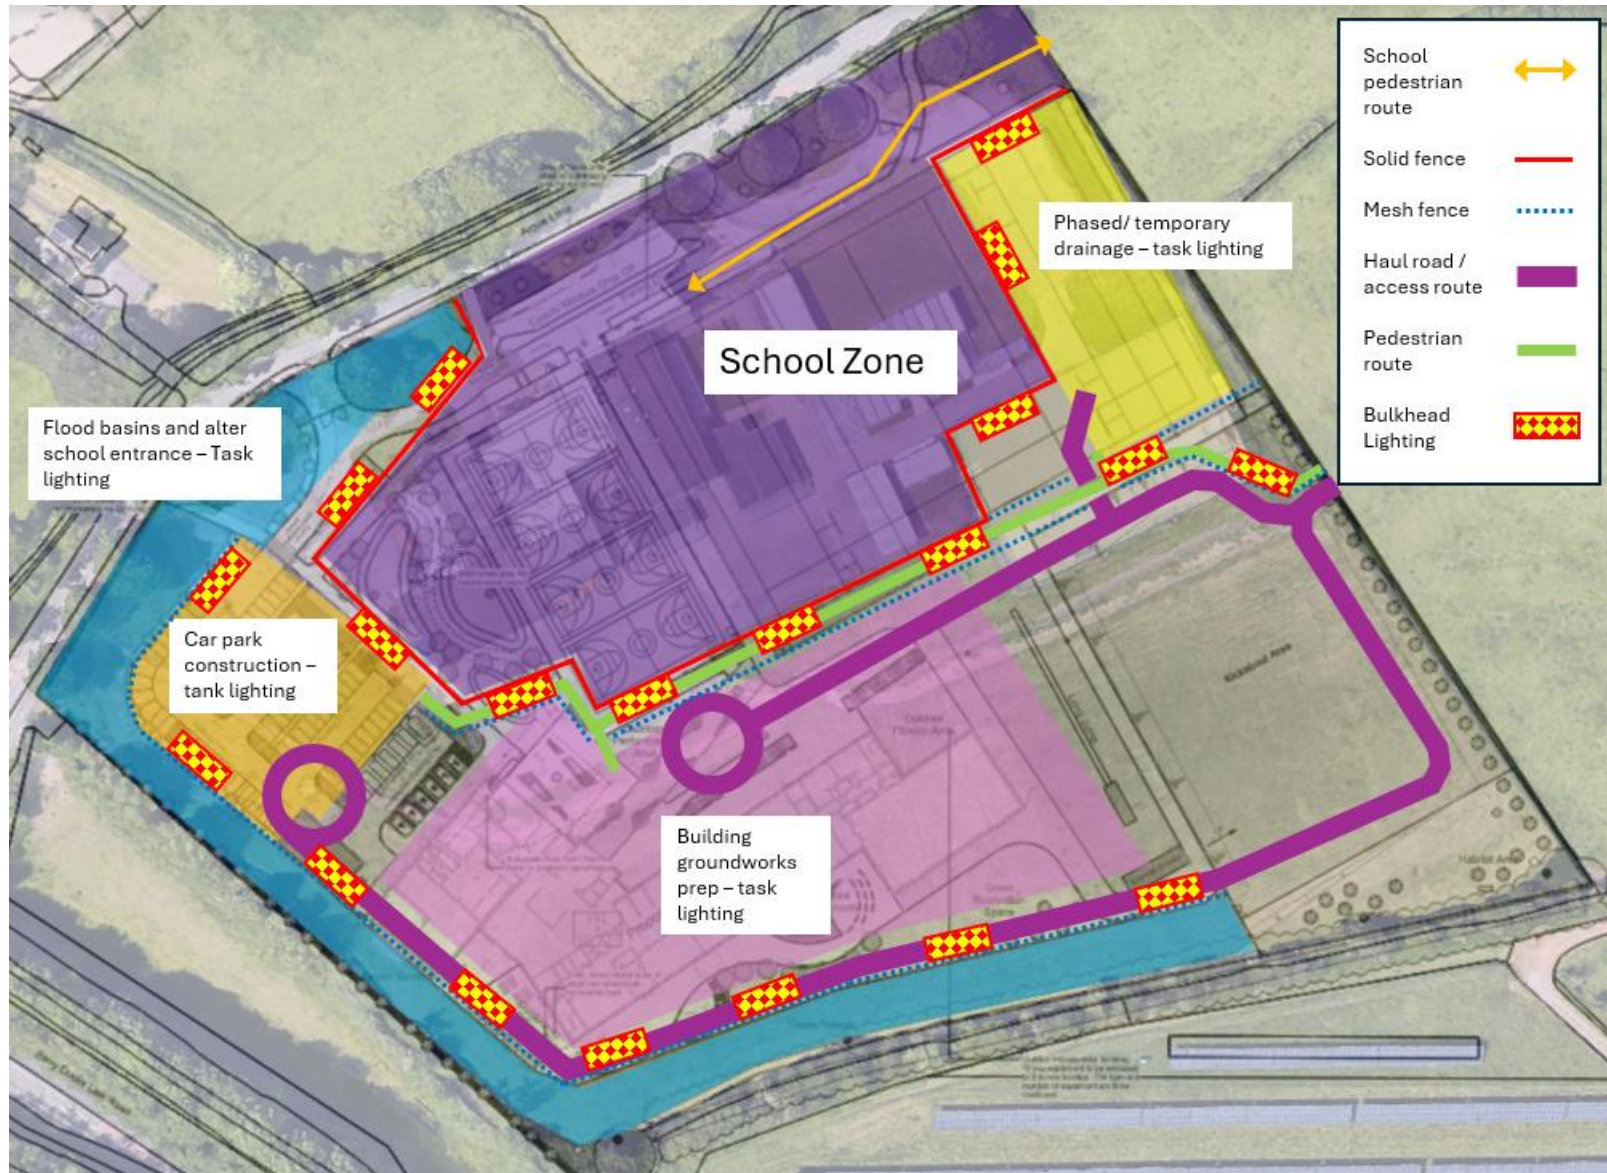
Site lighting flood alleviation, site prep and car park construction
